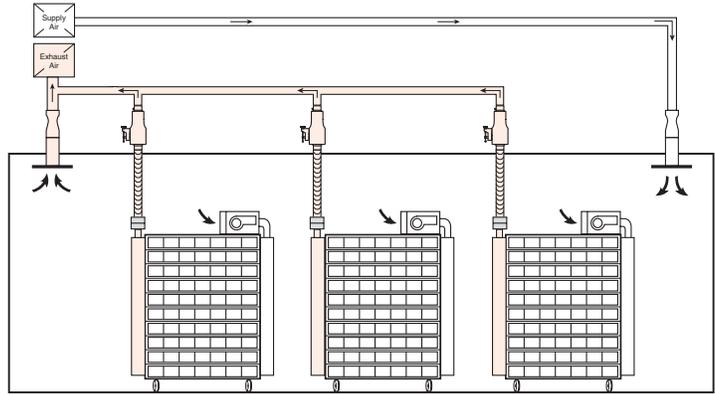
Room air with rack supply fan; rack exhaust connected directly to building (ventilation option #3).
